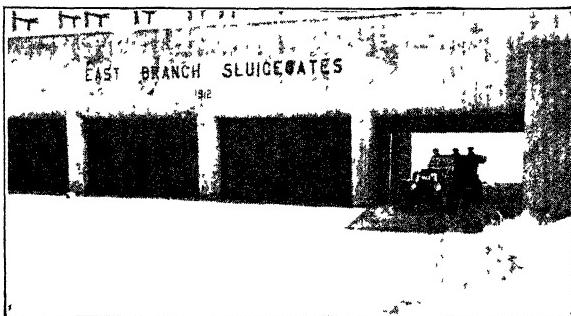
Typical American Regulating Sluices in Reinforced-Concrete Weir
